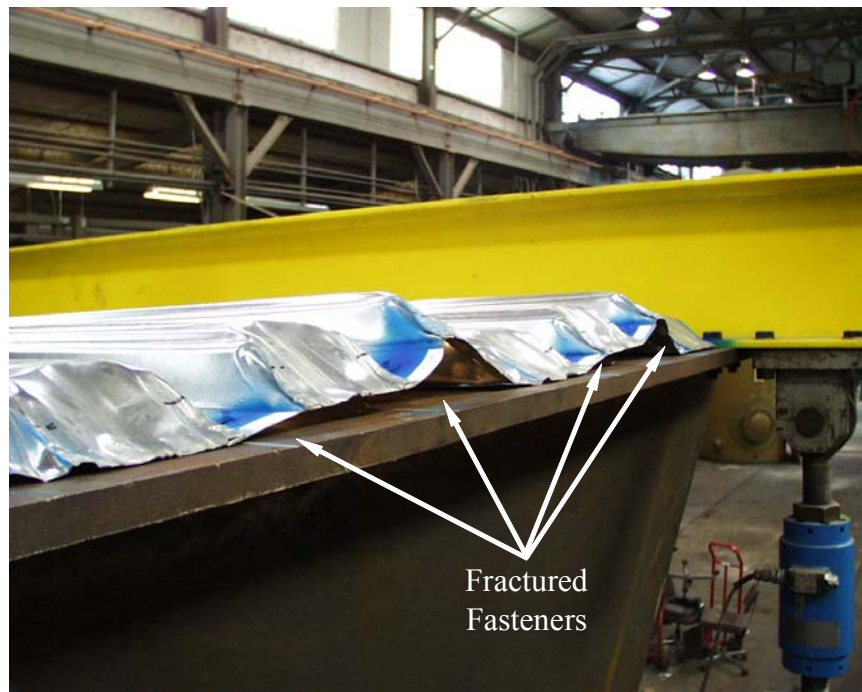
METAL DECK SHEETS BUCKLING AFTER END FASTENER FAILURES IN TEST M20-T3
